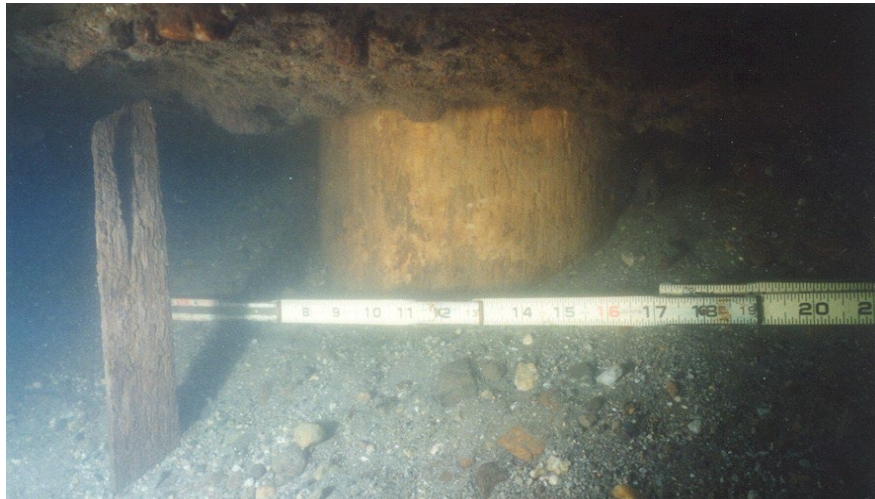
Pier Undermining, Exposing Timber Foundation Pile
